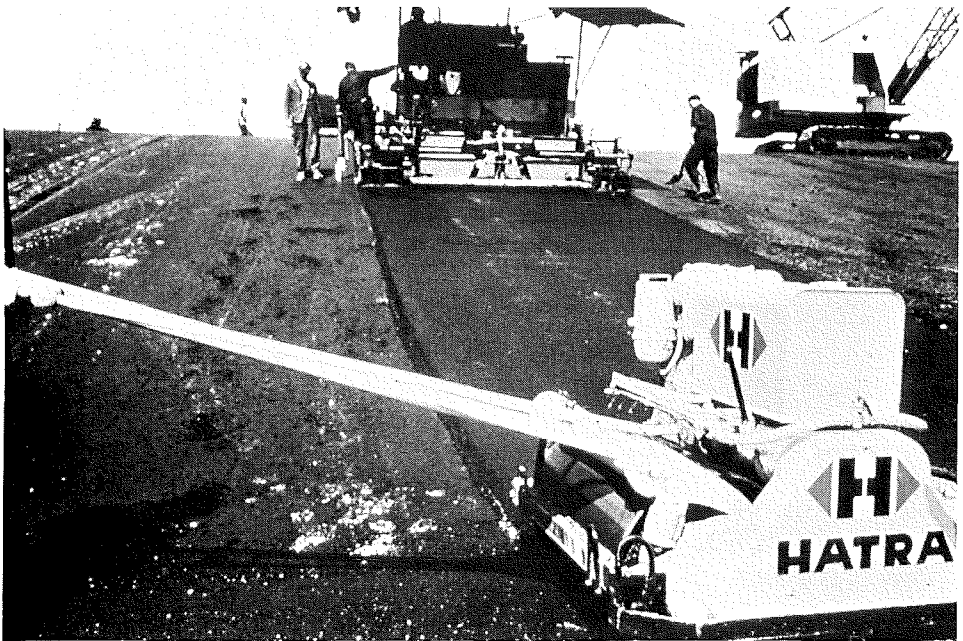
Construction of an asphaltic concrete revetment using a normal road finisher
